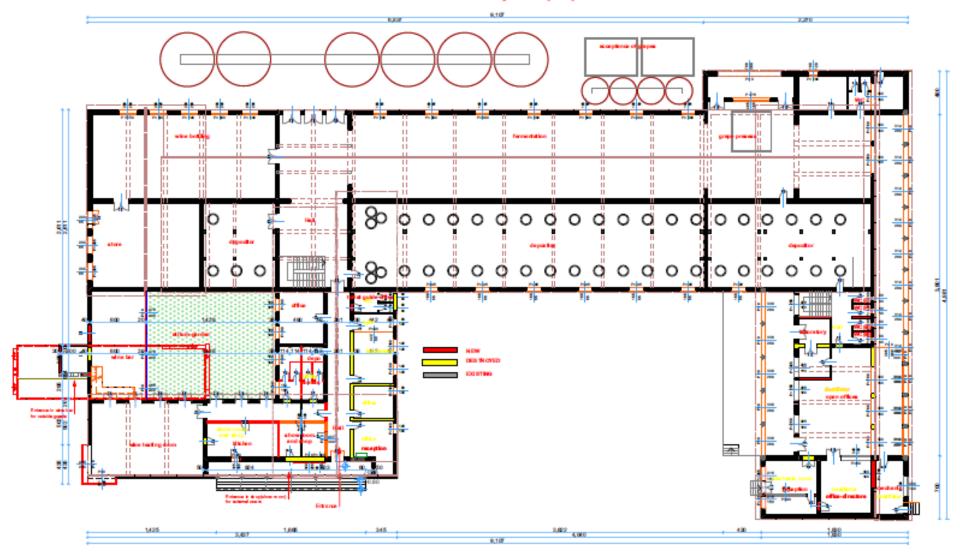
Version 4, selected - Ground Floor Plan-Proposed reconstruction
